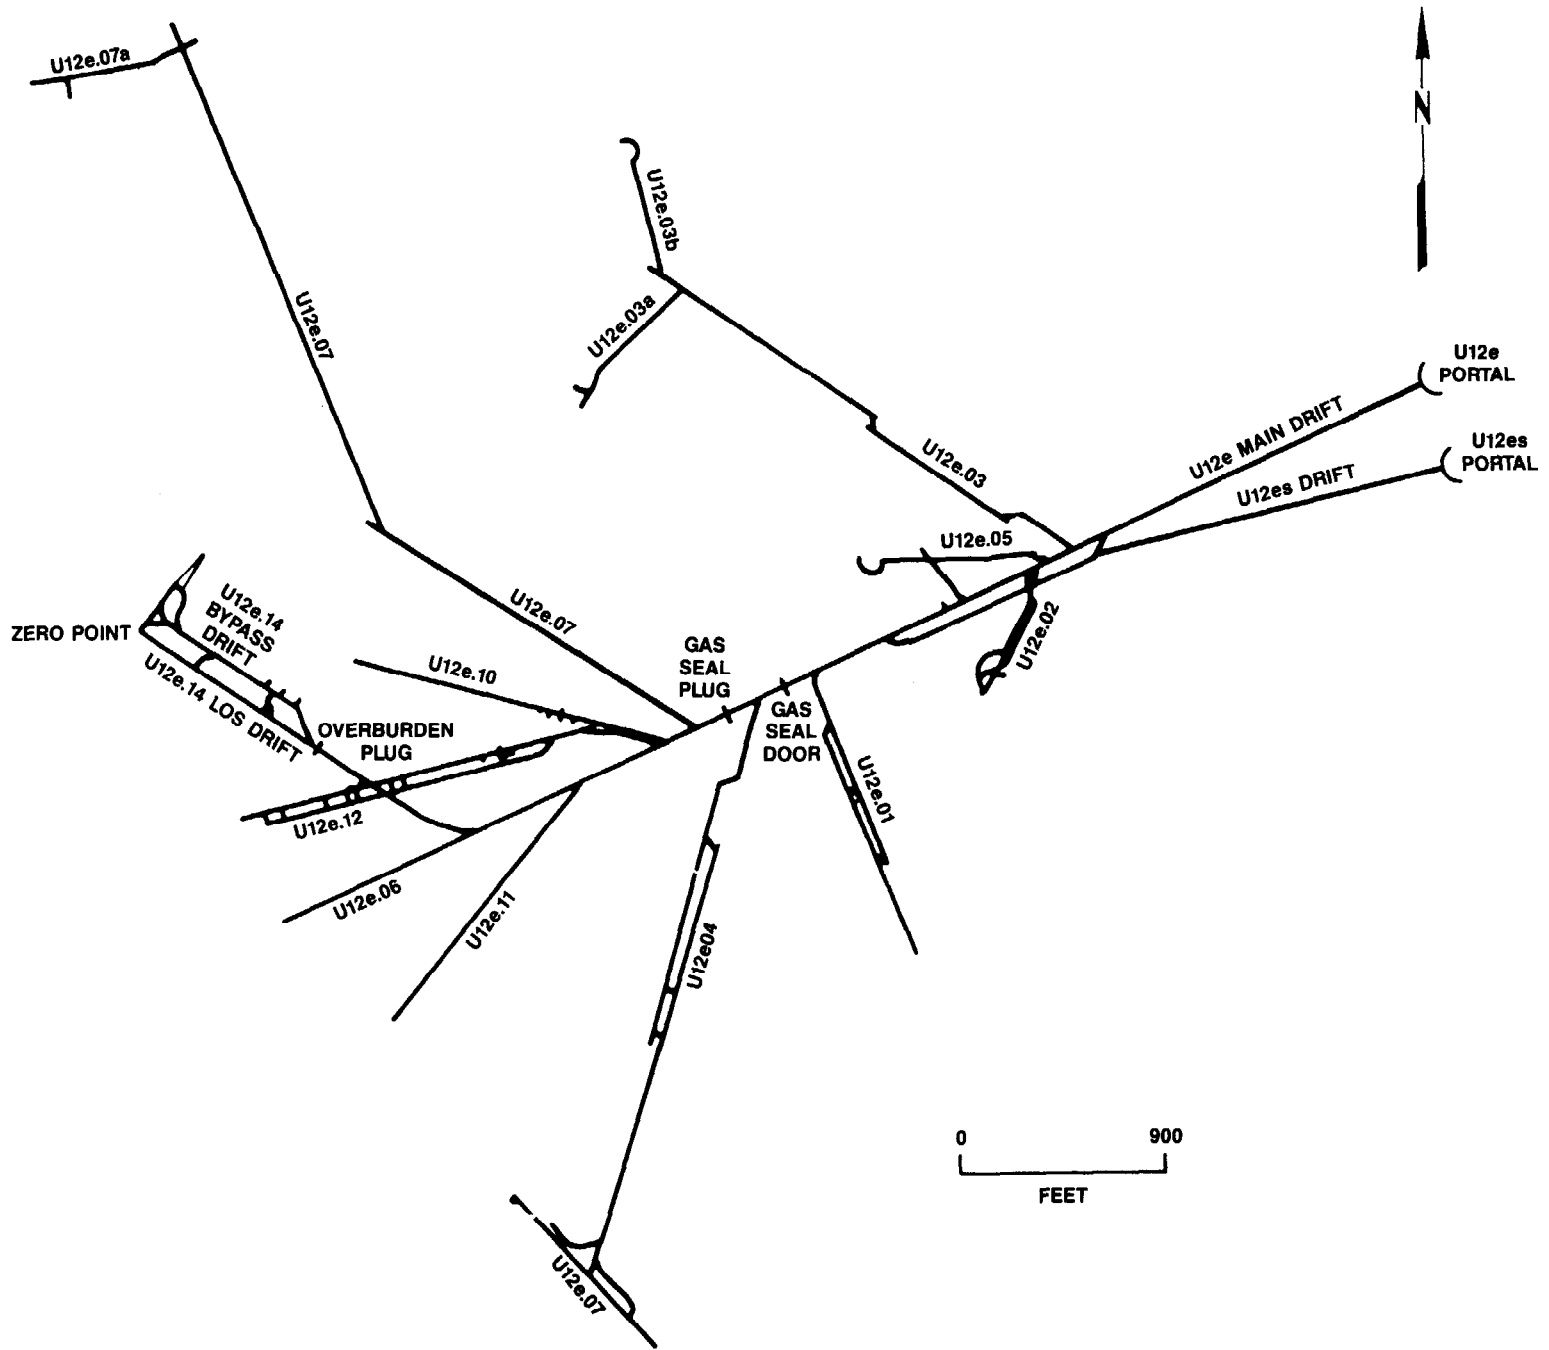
DIDO QUEEN Event - Tunnel Layout
